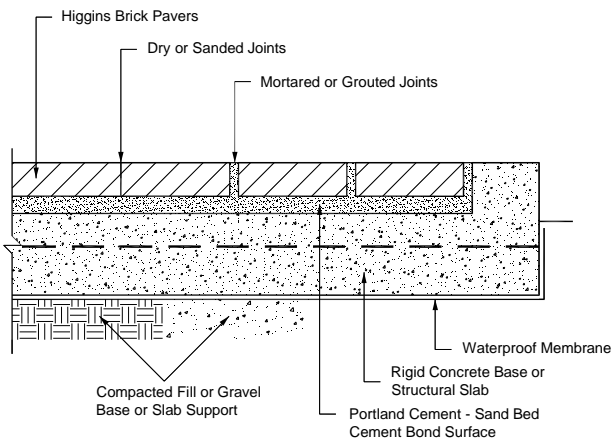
FIGURE A Concrete Base/Mortared Bed: Mortared, Grouted or Dry Joints
